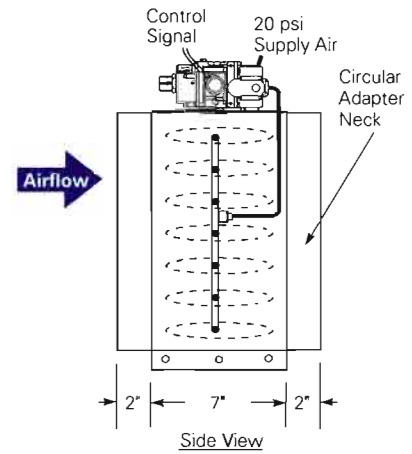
Tek-Air PRD Dimensional Drawings\
